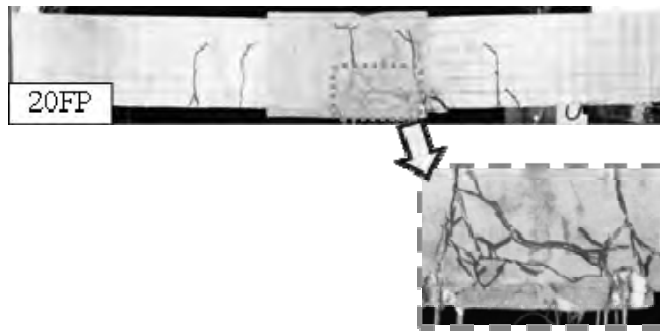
Crack pattern of specimens retrofitted by ferrocement jacket without skeleton steel (observed on main beam)
